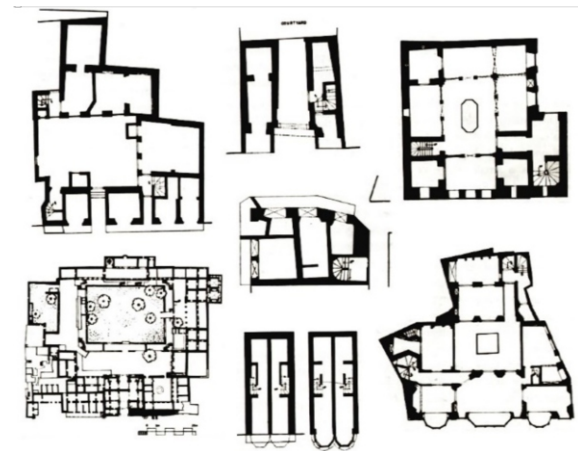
Traditional house typical layouts in the Walled City of Lahore.
